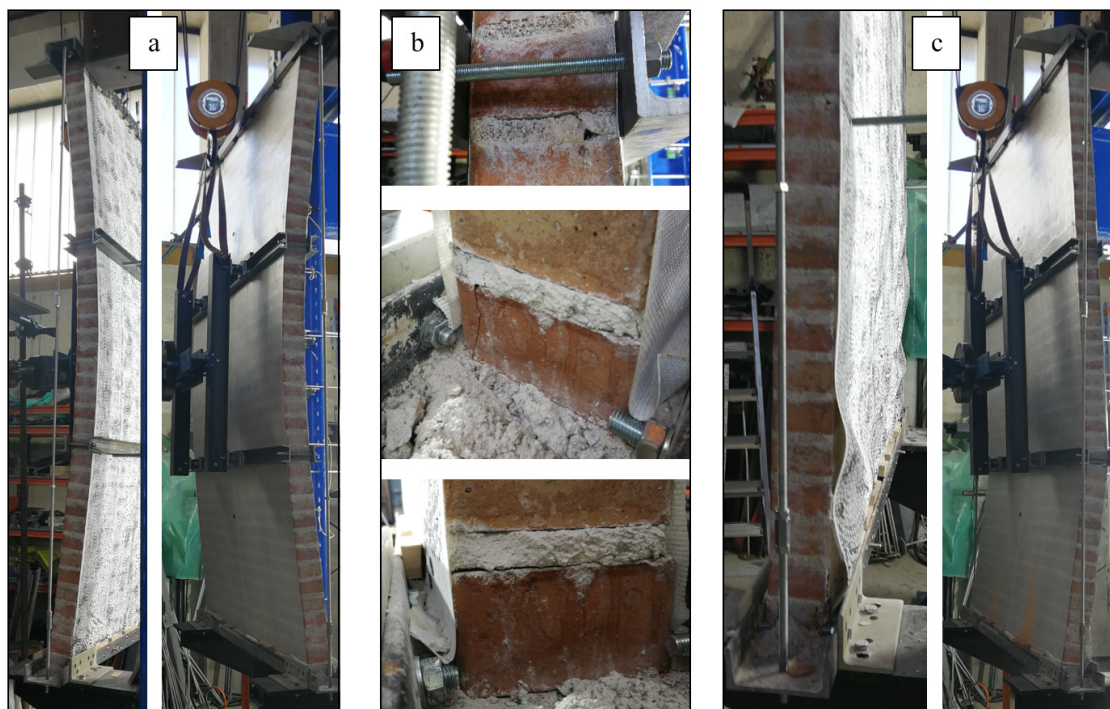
Testing of the non-structural wall specimen NF-1A: (a) Deformation shape, (b) specimen's damage occurred during quasi-static cyclic testing.
